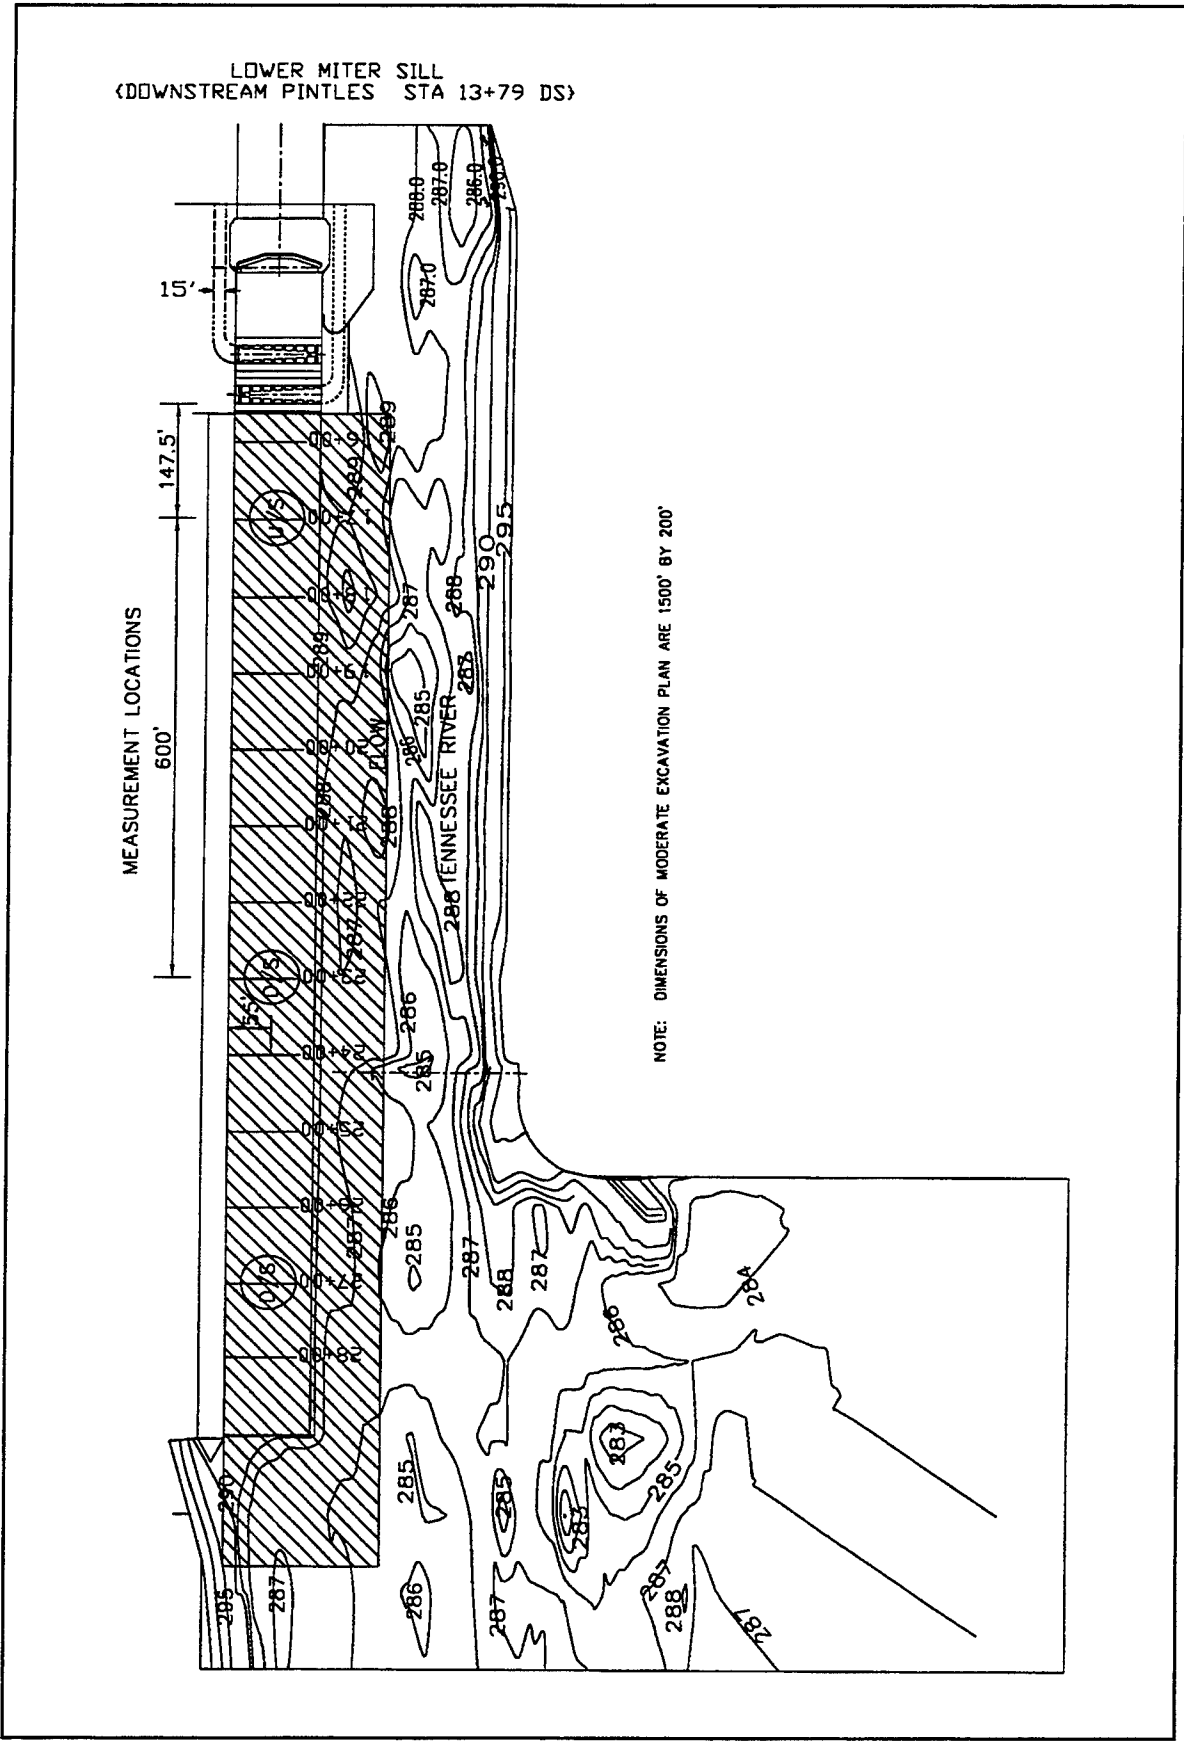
Moderate excavation plan, interlaced lateral discharge alternative
